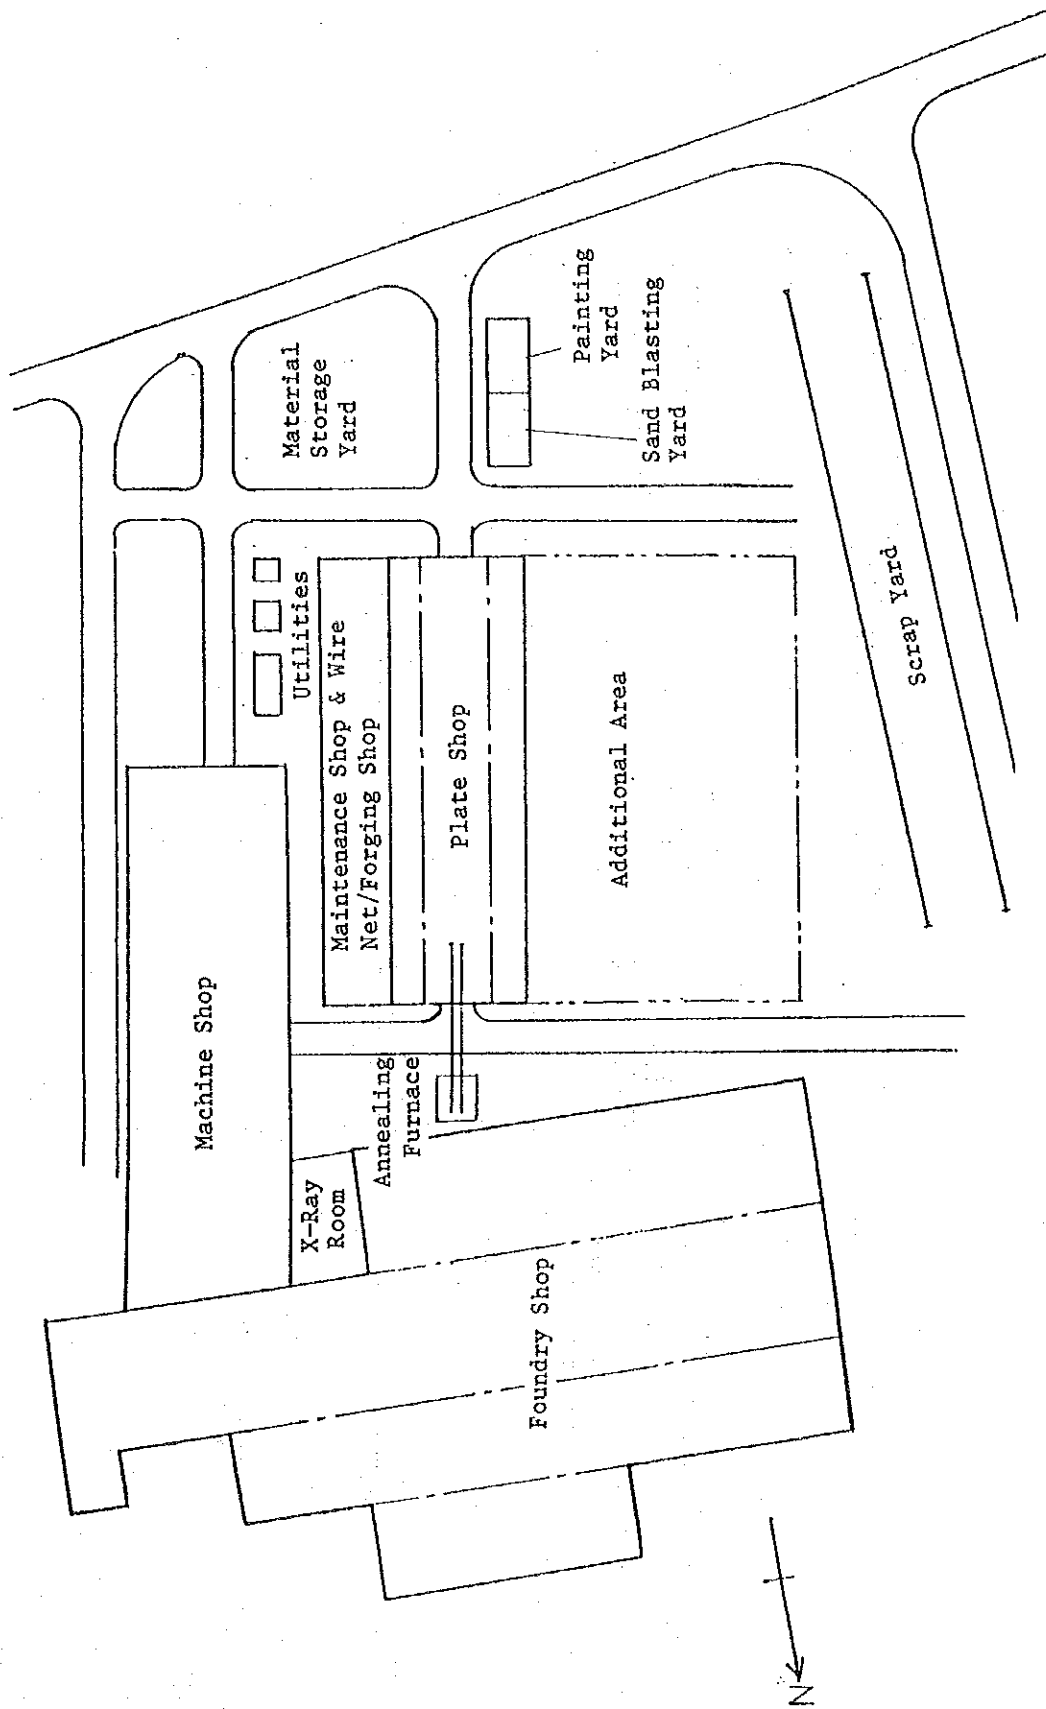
Entire Plate Shop Layout Plan
